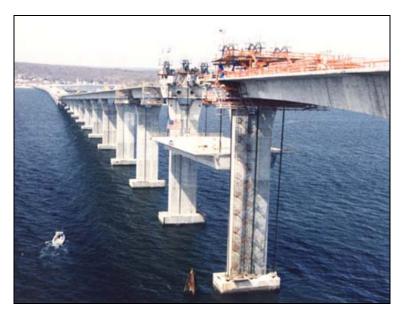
Heavy-Lift Construction (Jamestown-Verrazanno Bridge)
